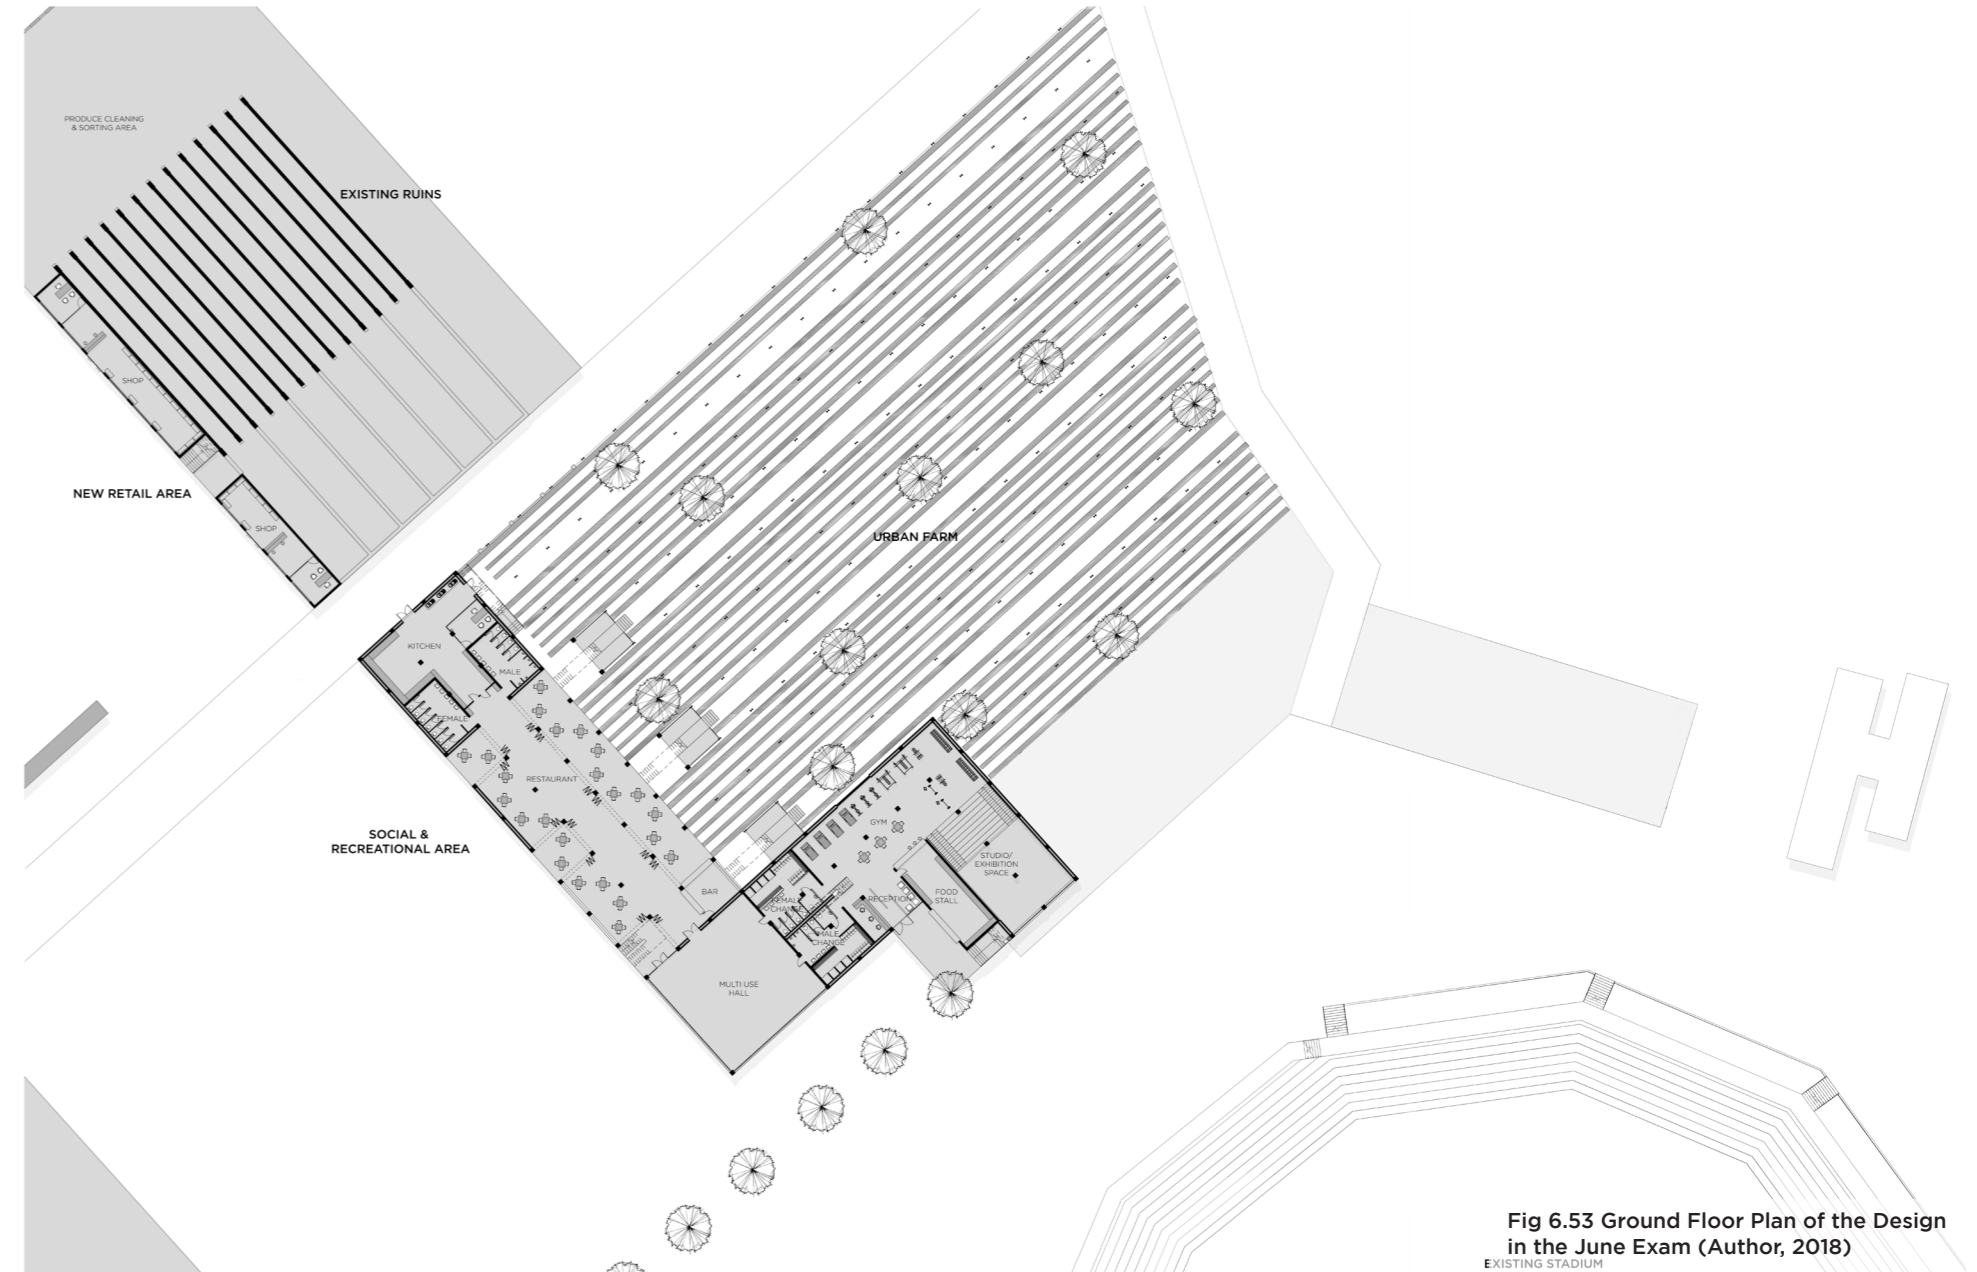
Ground Floor Plan of the Design in the June Exam (Author, 2018)
